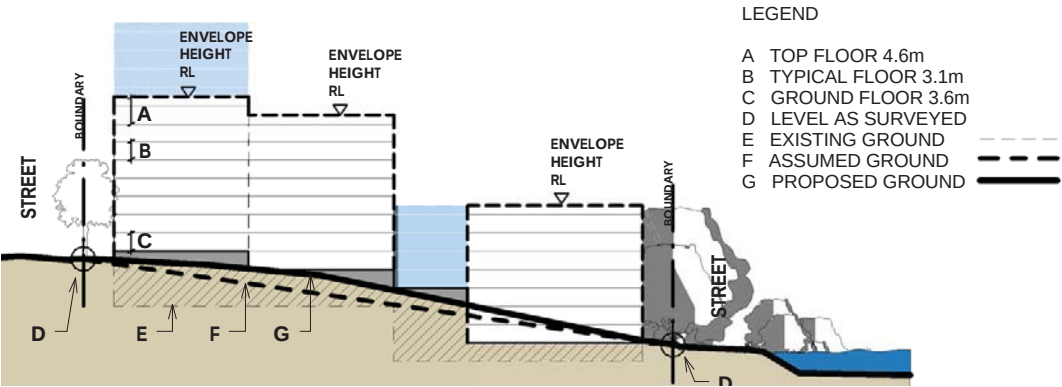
CONCEPT PLAN METHOD OF DEFINING HEIGHT
